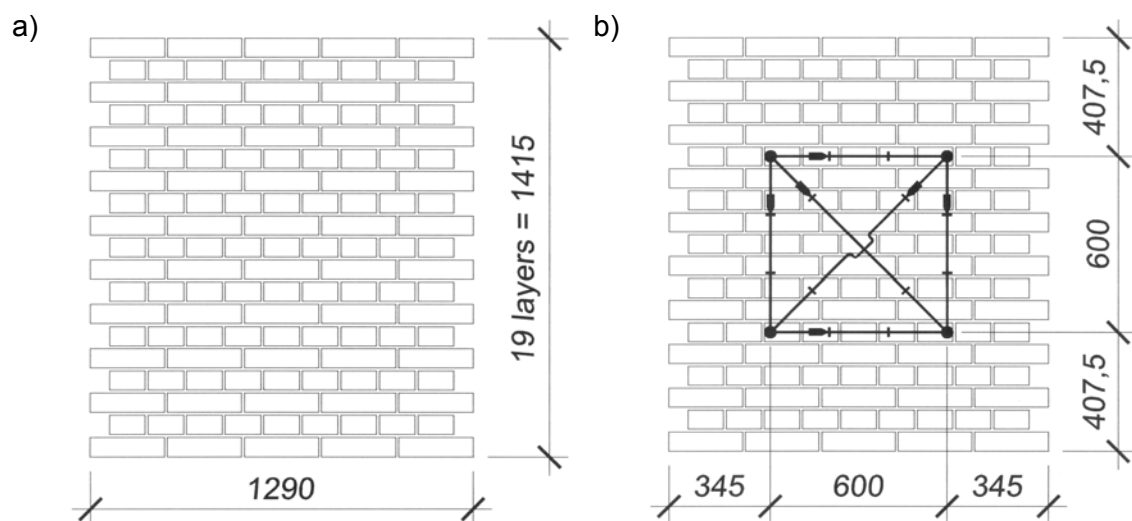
Test specimens: a) - shape and overall dimensions; b) - frame measure arrangement
